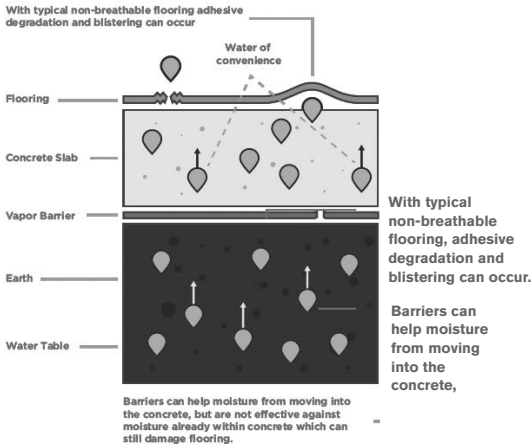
Moisture Activity Beneath and Within a Concrete Slab with Flooring Installed
